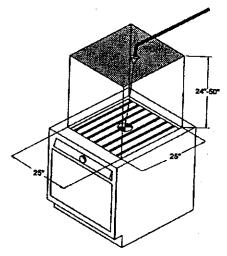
Model NL-R Nozzle Placement, Radiant Charbroller.
